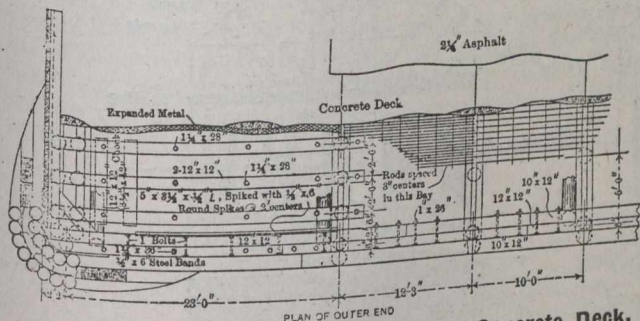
Corner Construction Reinforced Concrete Deck.
